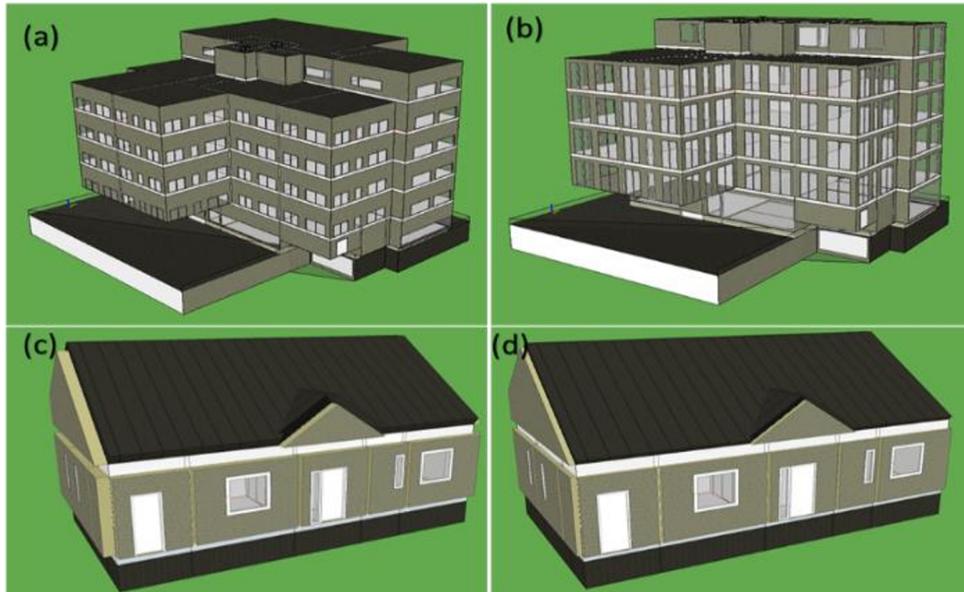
3D Model of the reference buildings. (a) office building with small windows, (b) office building with big windows, (c) single-family house with thick walls (lower U value, representing new house), and (d) single-family house with thin walls (representing old house)
